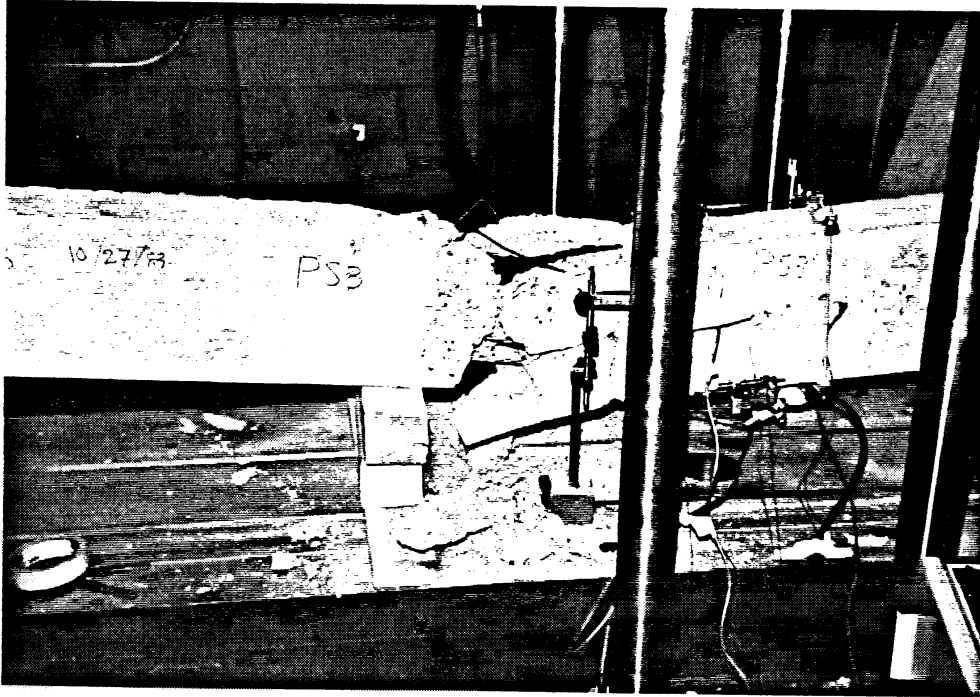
Typical Beam Failures: PS3, PD1
